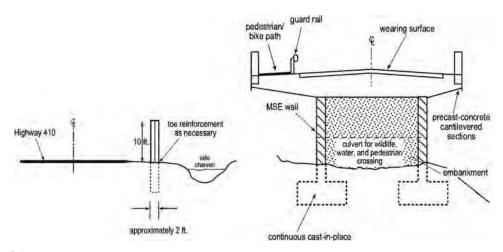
Highway with sheet pile floodwall (Left); elevated cantilevered highway (Right) (source: WSDT, 2012).
